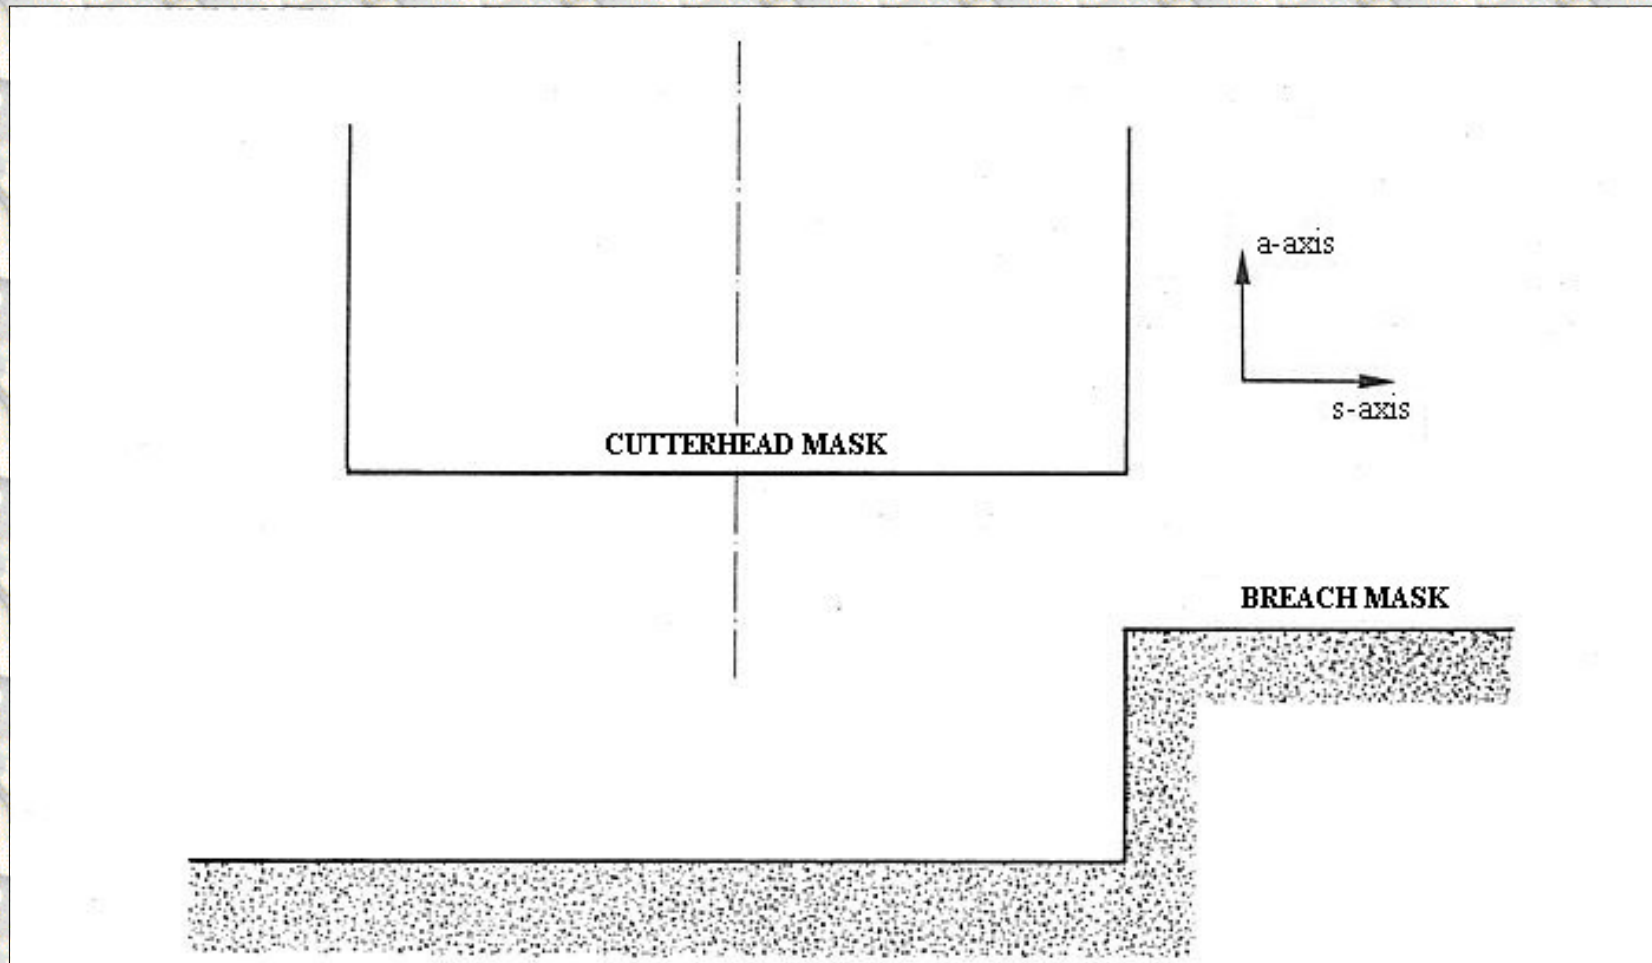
Possible axial bank and cutterhead masks (initial).
